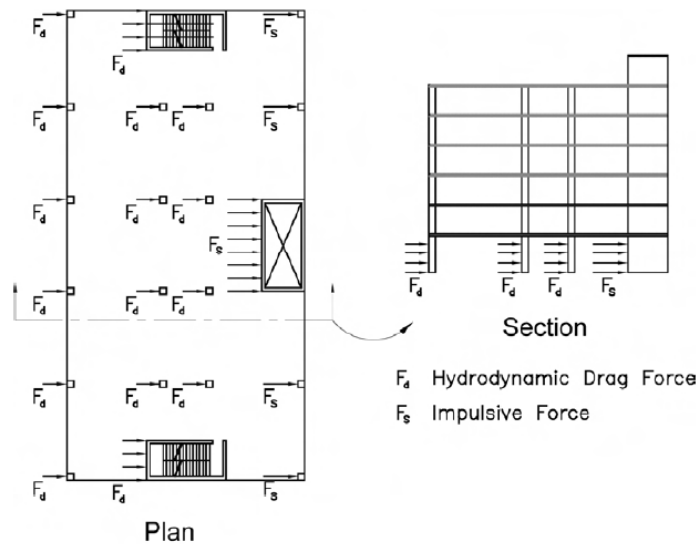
Impulsive and drag forces applied to an example building (FEMA P646, 2008)
